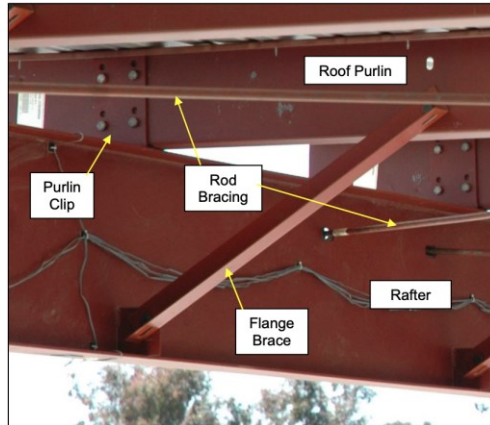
Application of rod bracing in the roof of metal building systems [36].
